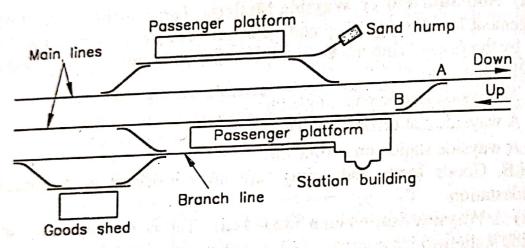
A Double-line Wayside Station with Goods Siding and Dock Platform.
